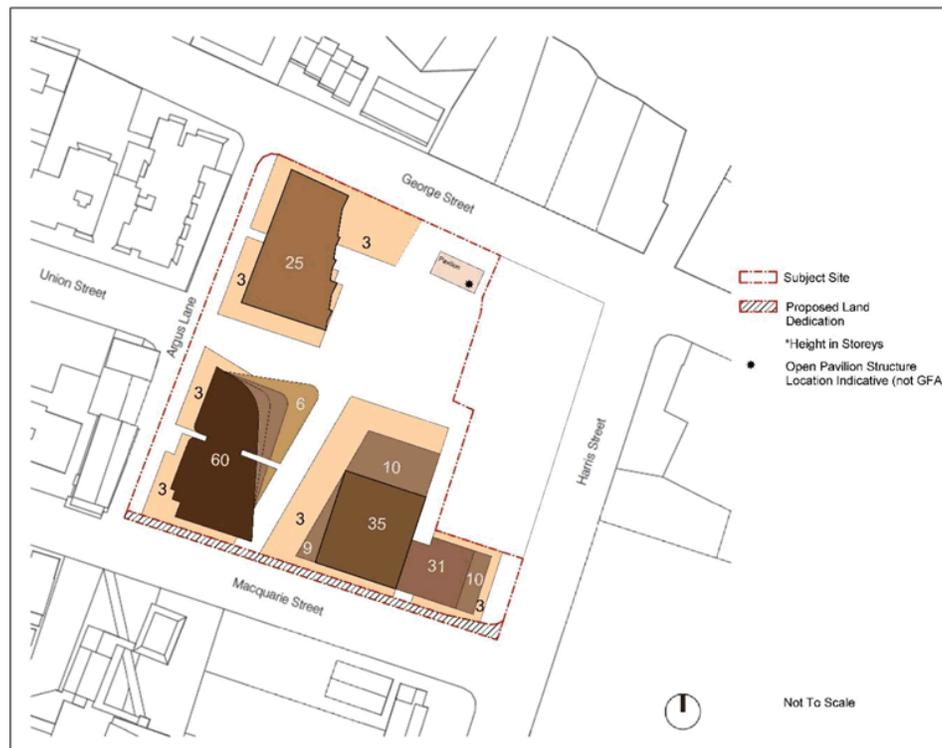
Control diagram: Height of buildings in storeys
